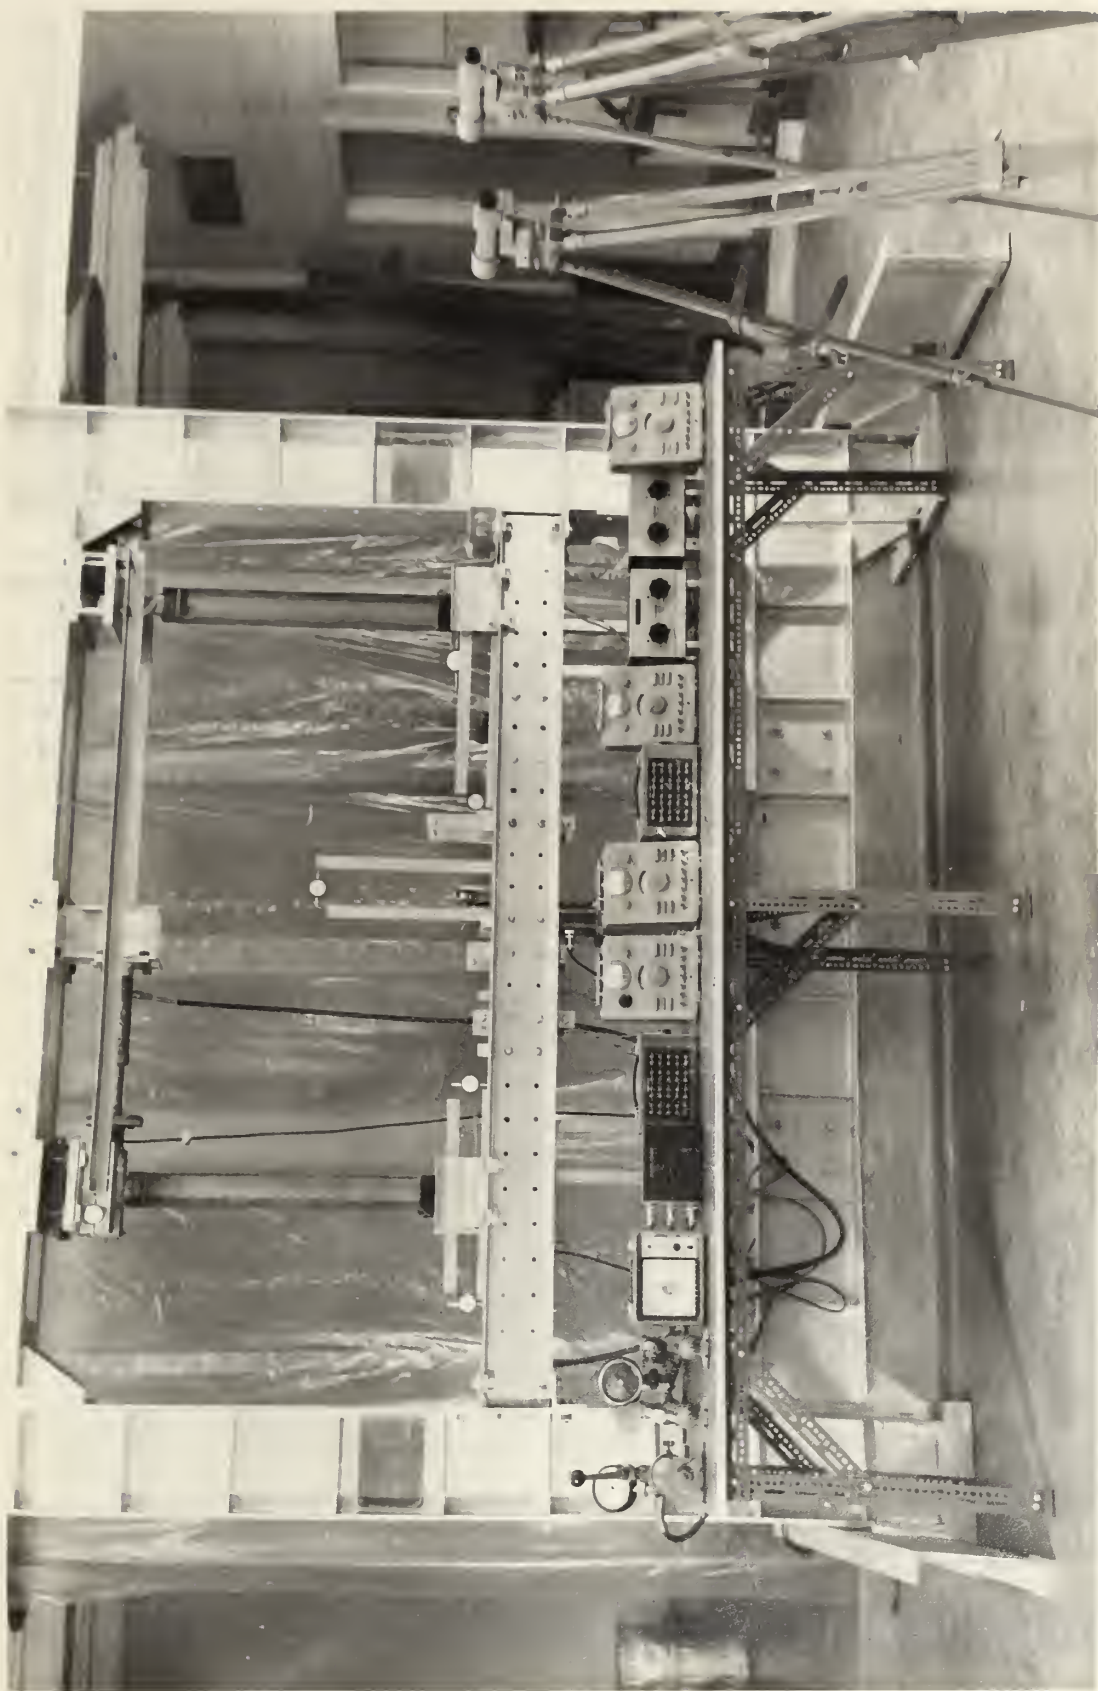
GENERAL VIEW OF FRAME TEST EQUIPMENT
